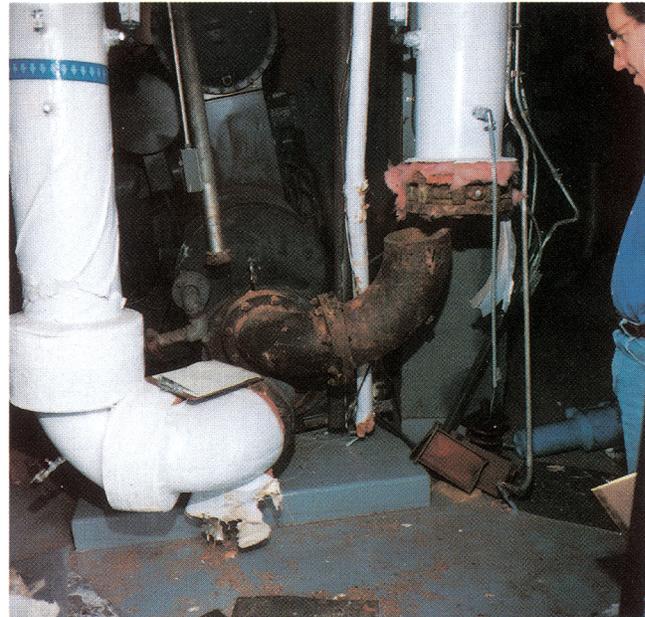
Piping failures at interface connections can be prevented with the use of elastomeric joints (15th floor location, 15 stories, approximate maximum seismic excitation - 0.4 g horizontal, 0.28 g vertical).
